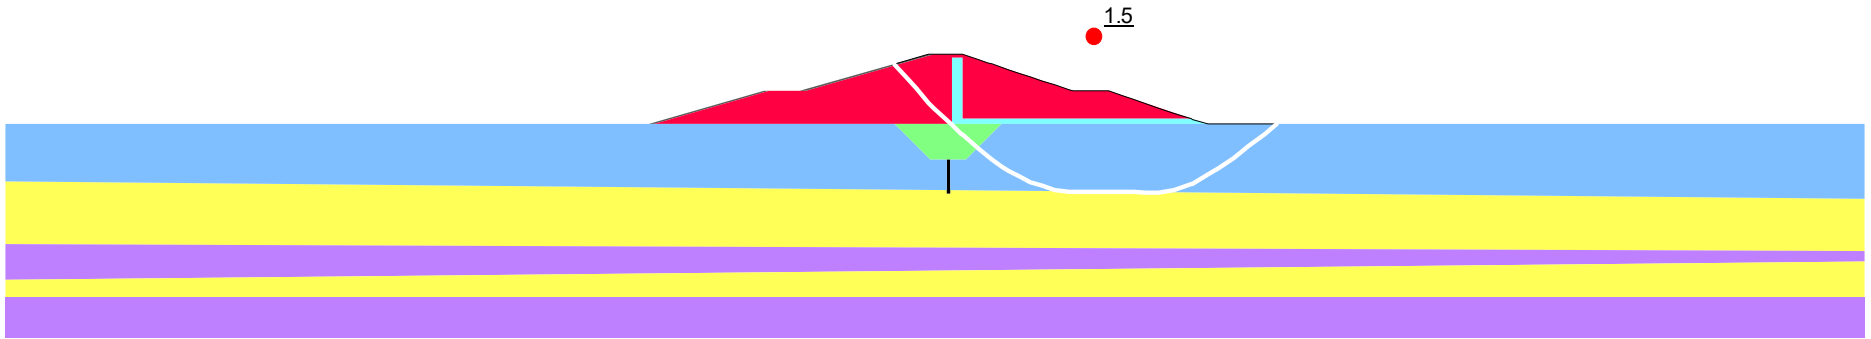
Alternative 1 End of Construction Downstream Factor of Safety— Walnut
